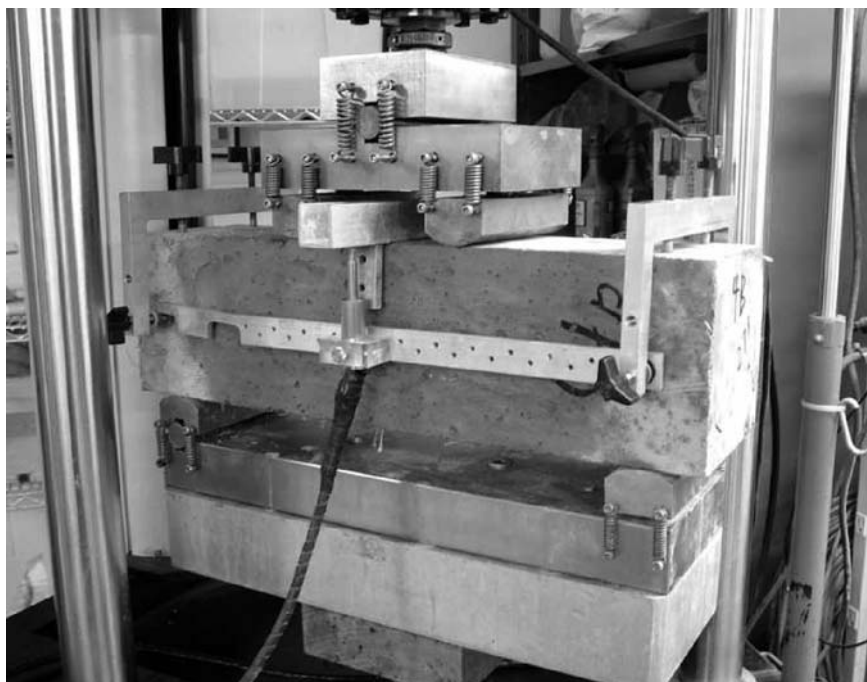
Arrangement to Obtain Net Deflection by Using Two Transducers Mounted on Jig Secured to Specimen Directly Above Supports
